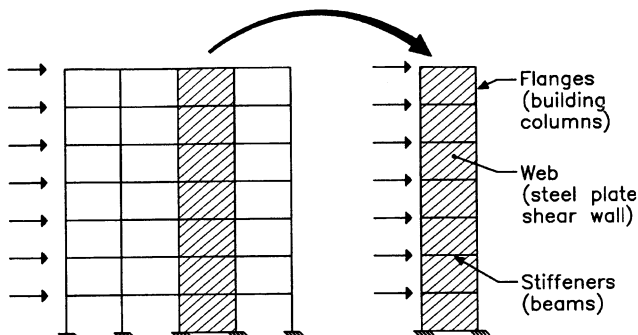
Steel plate shear wall and plate girder analogy [11].
